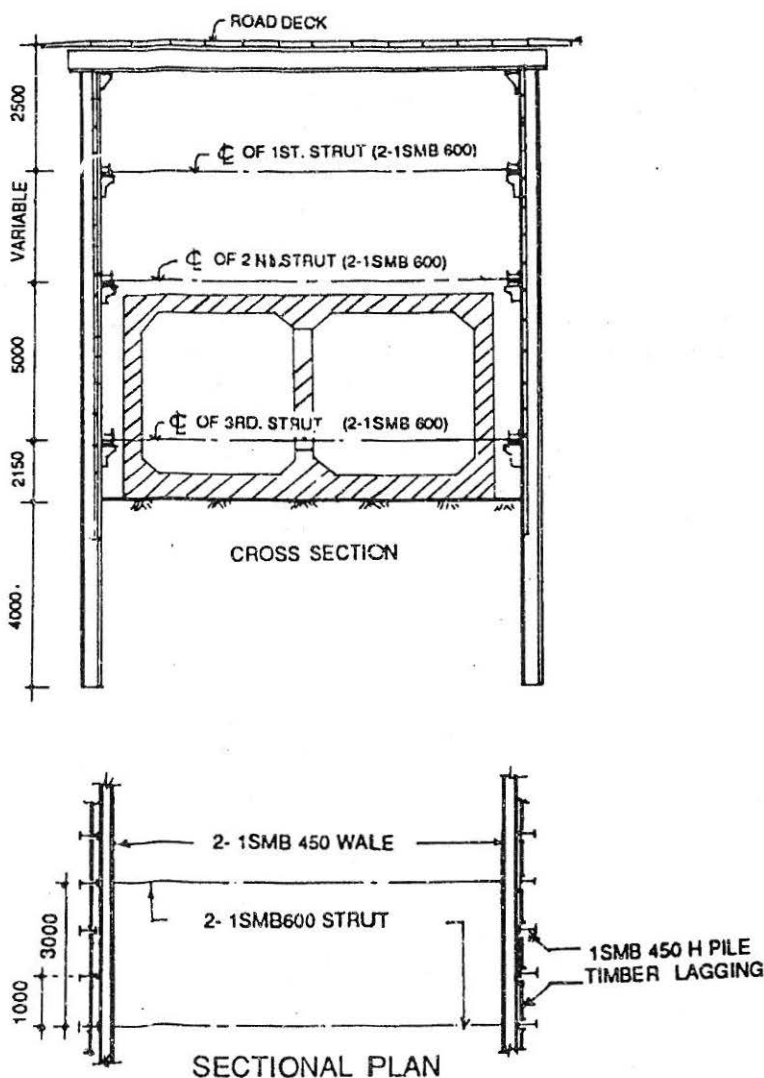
Excavation with H-Pile and Timber Lagging
